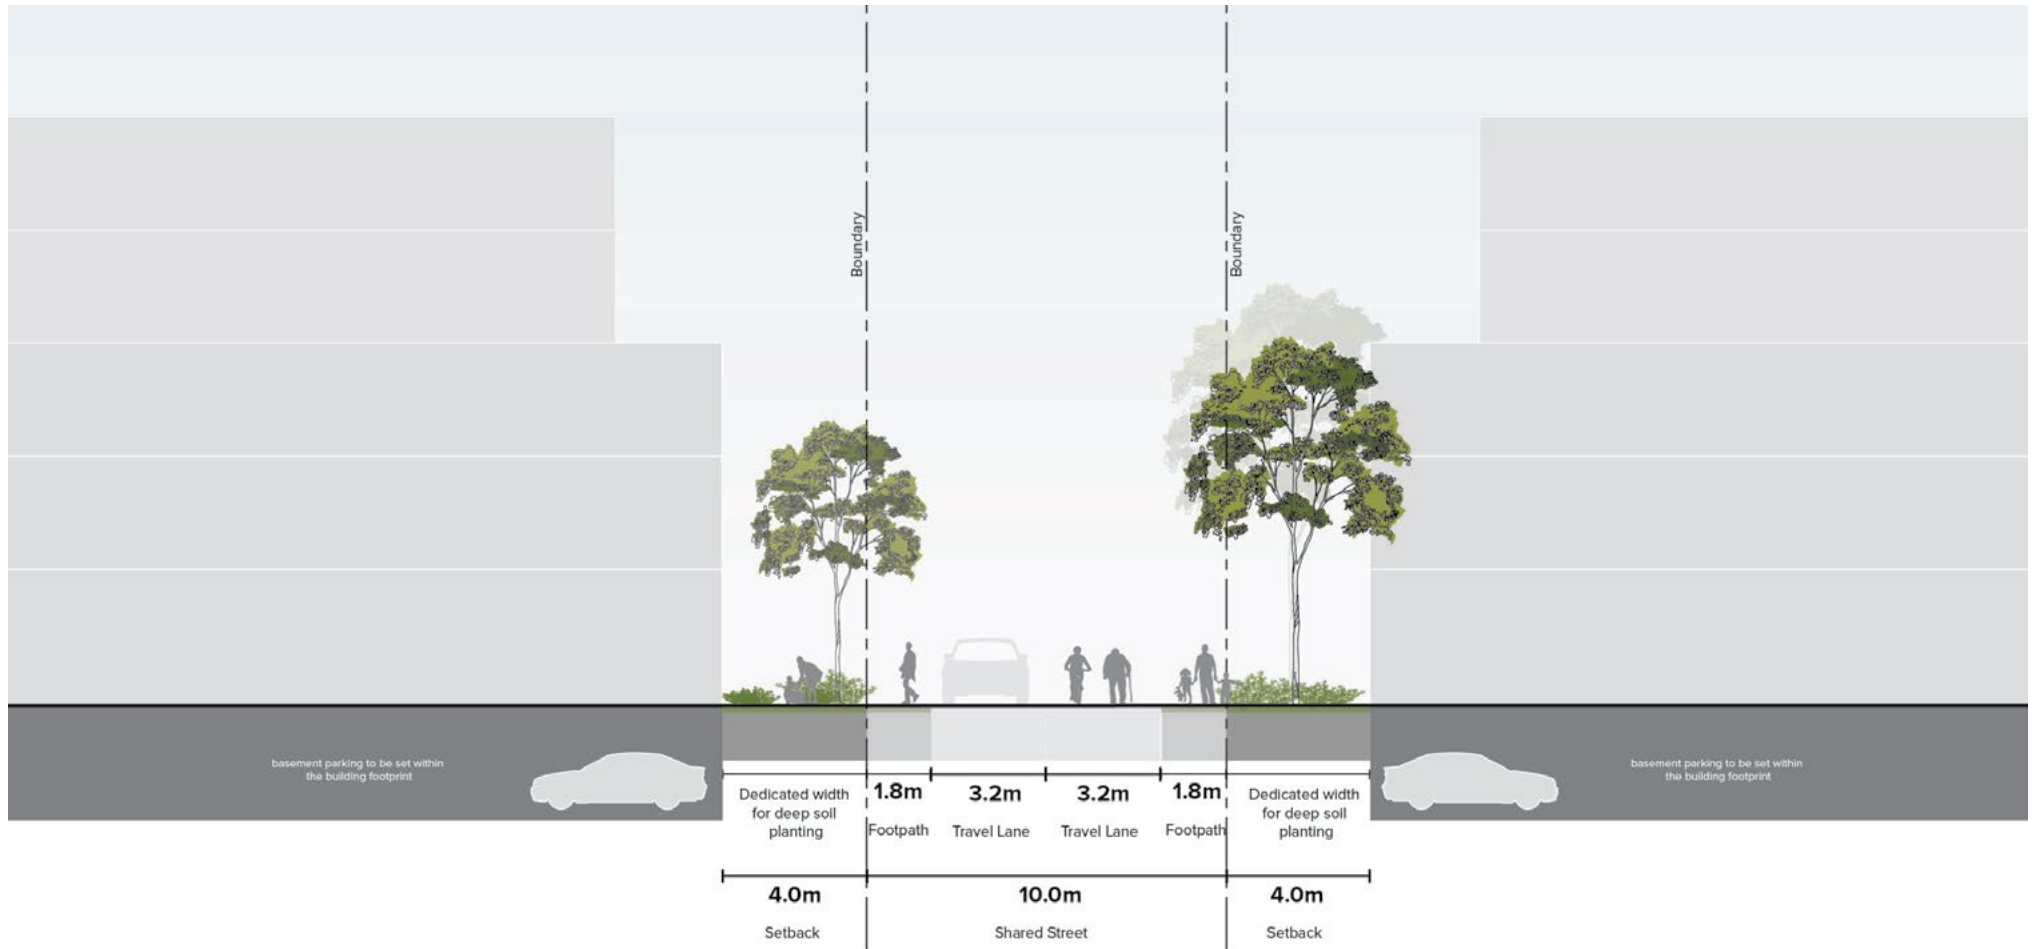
Typical shared street/mews – indicative street section. Credit: Hatch RobertsDay.
